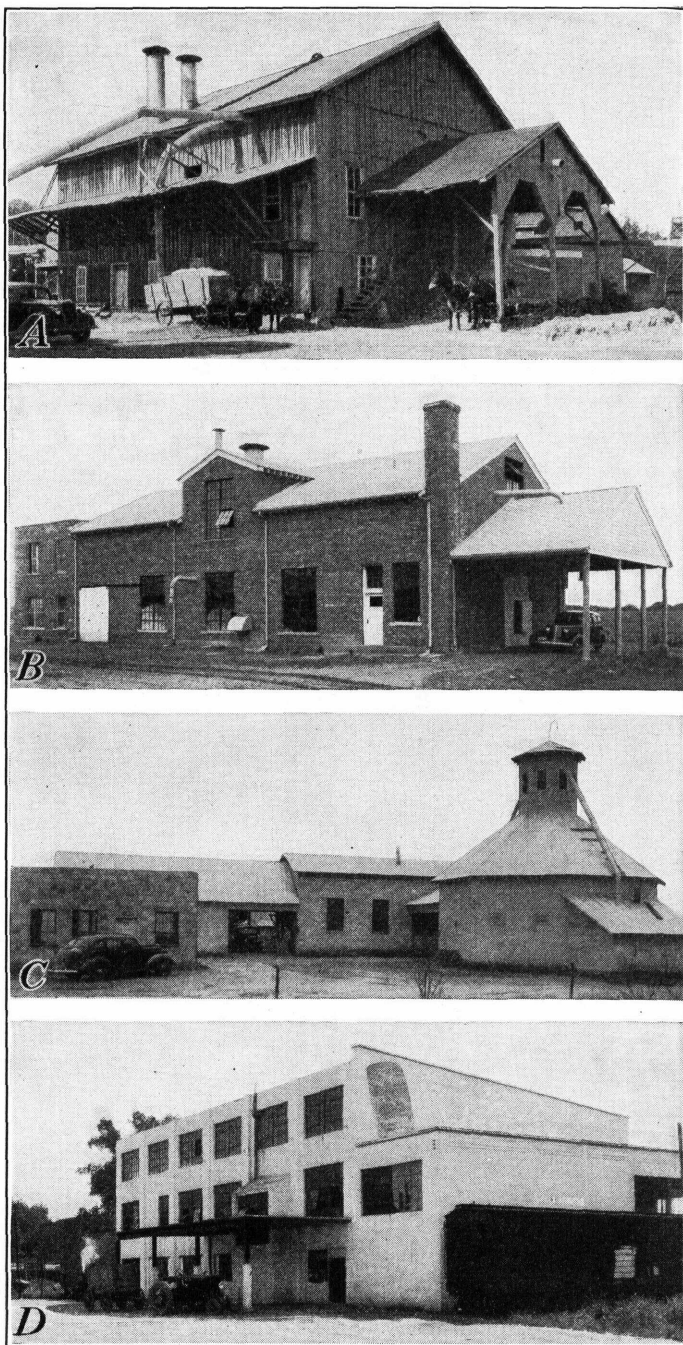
Cotton-gin buildings: A, Old-type wooden construction; B, brick; C, hollow tile; D concrete.
